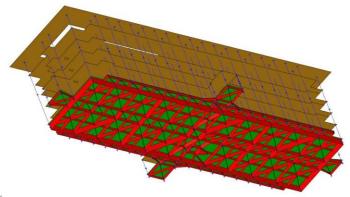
3D view of building showing the upper structure and supported SNSF foundation system.
